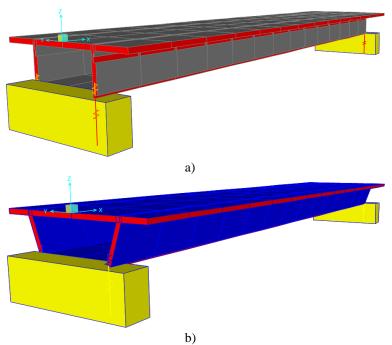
3D view of bridge model for rectangular and trapezoidal box girders
